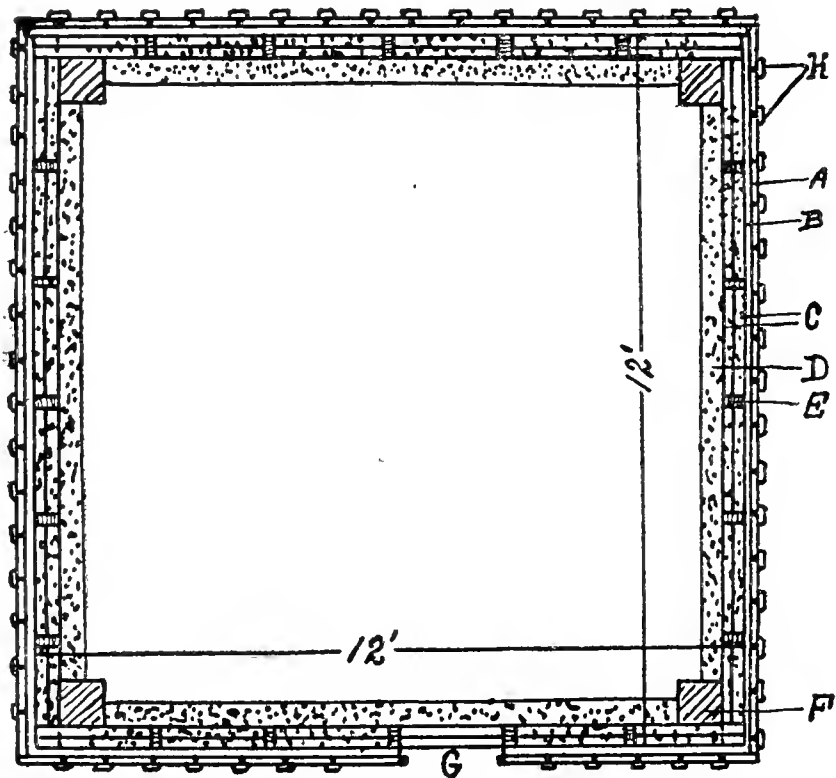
Well-built farm ice house plan. A, siding placed vertically; B, inside layer of boards placed horizontally; C, sills and plates made of two 2 by 4's spiked together; D, sawdust; E, 2 by 4 studs on 24 inch centers; F, posts about 7 by 7, 3 feet in ground and 11 feet above ground; G, opening for ice full height of house, and closed by boards placed in groove, constructed as shown in drawing; H, battens.
